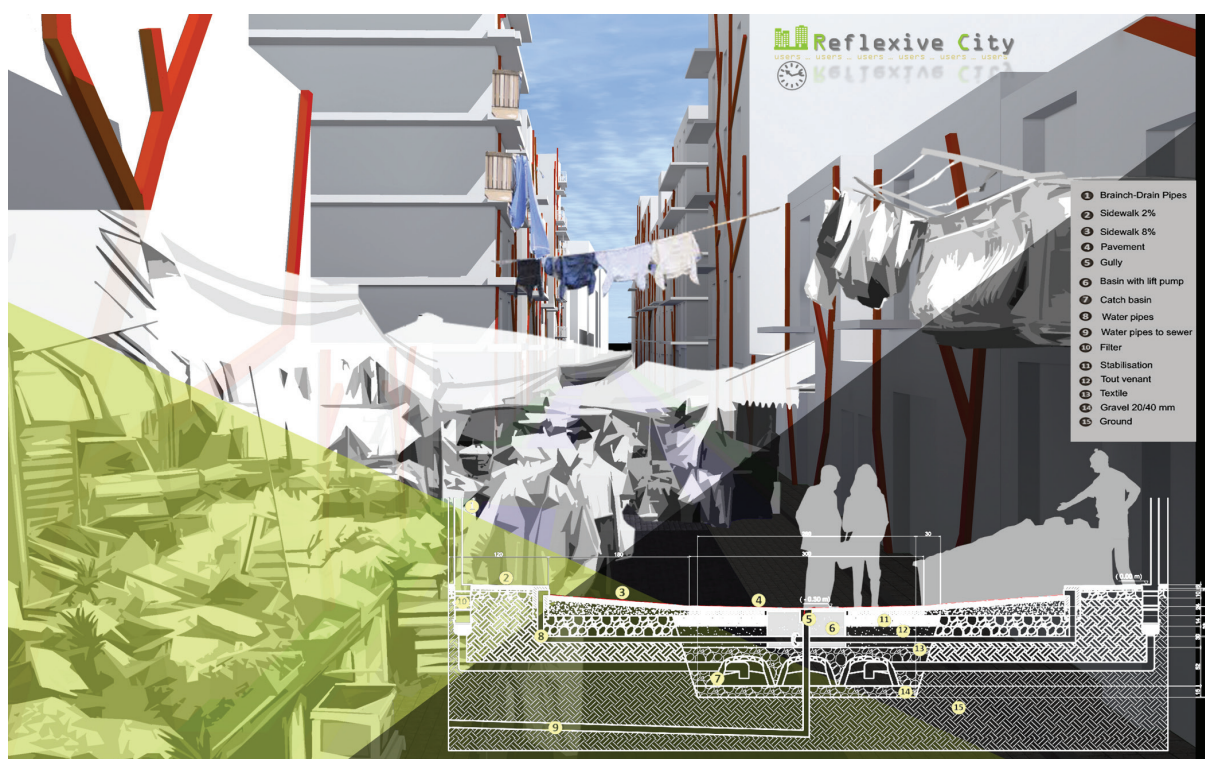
Via Sopramuro section with drain pipes plants. Source: M. Buanne.
